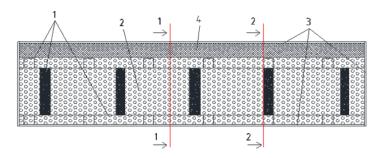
Transverse (horizontal) section of the new wall-enclosing structure: 1 – frame with LSTWS; 2 – foam polystyrene concrete 240 mm; 3 – fixed formwork with 10 mm chipboard plates; 4 – mineral wool or extruded polystyrene foam (100 mm)
